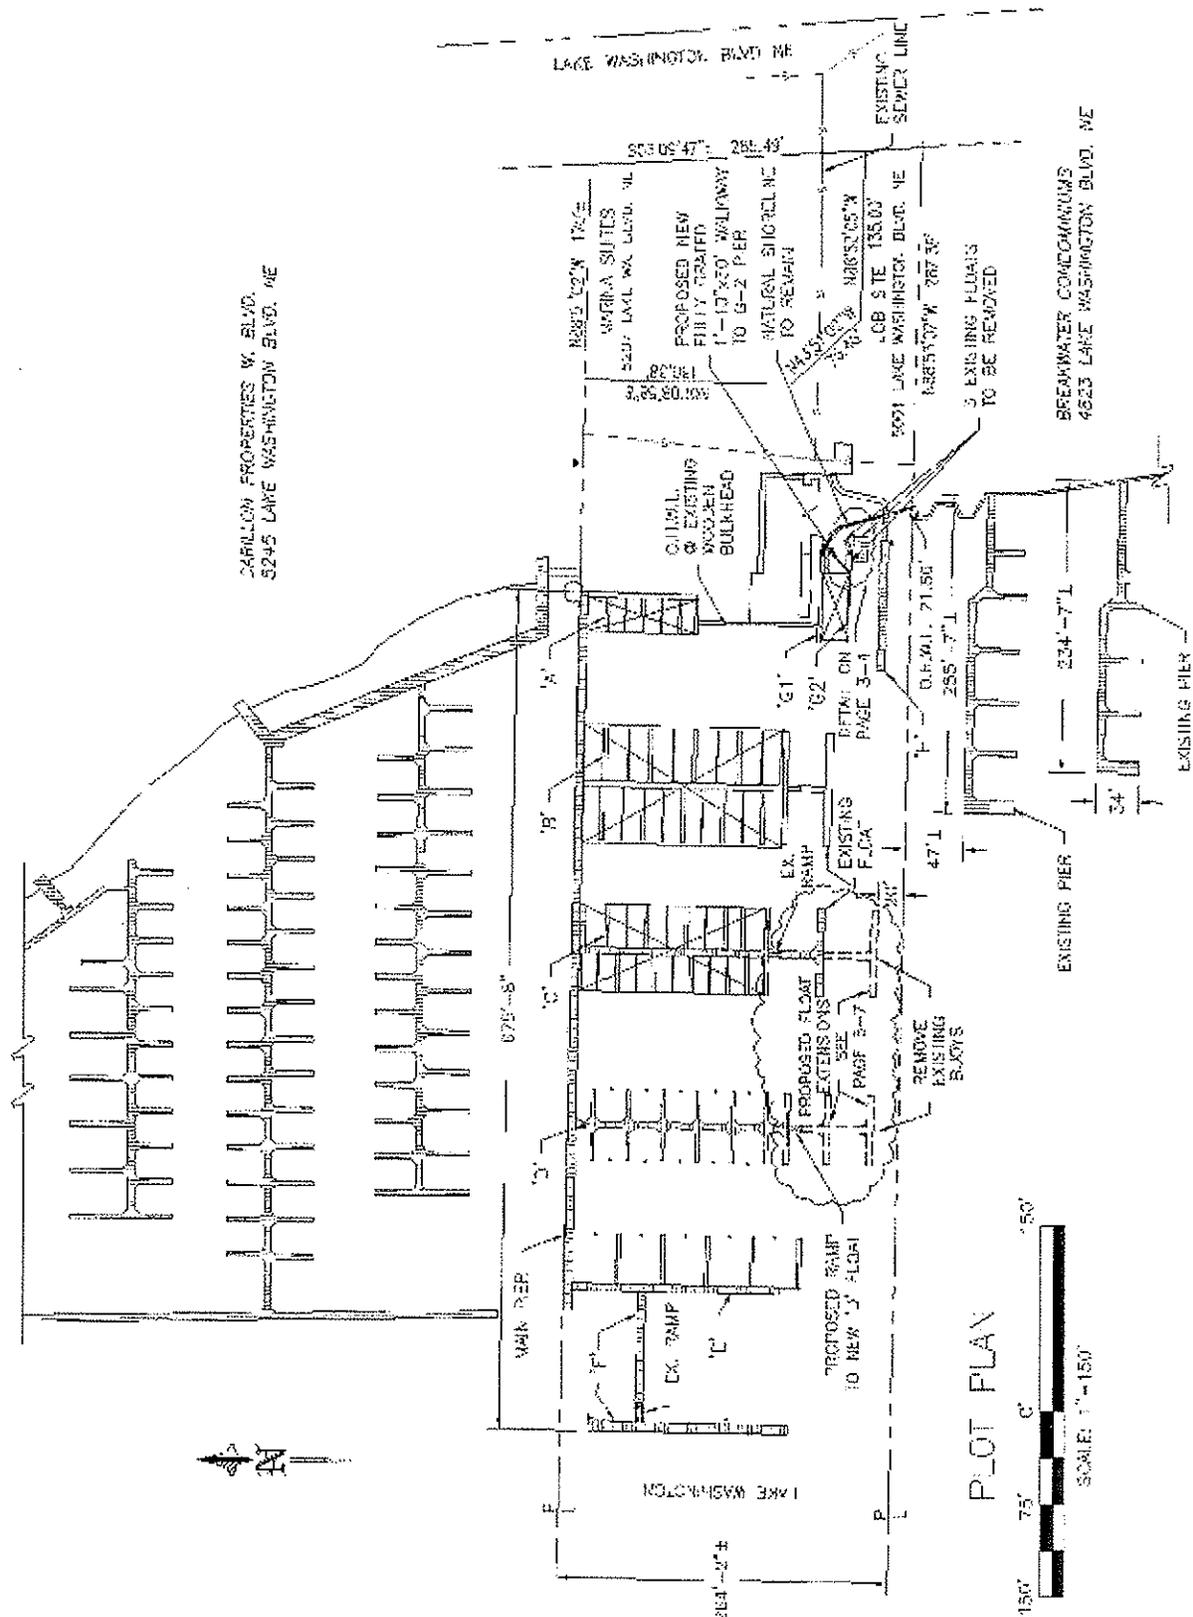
Plan view of the existing project site, including plan views of shoreline structures on neighboring properties (prepared by Waterfront Construction Inc.).
